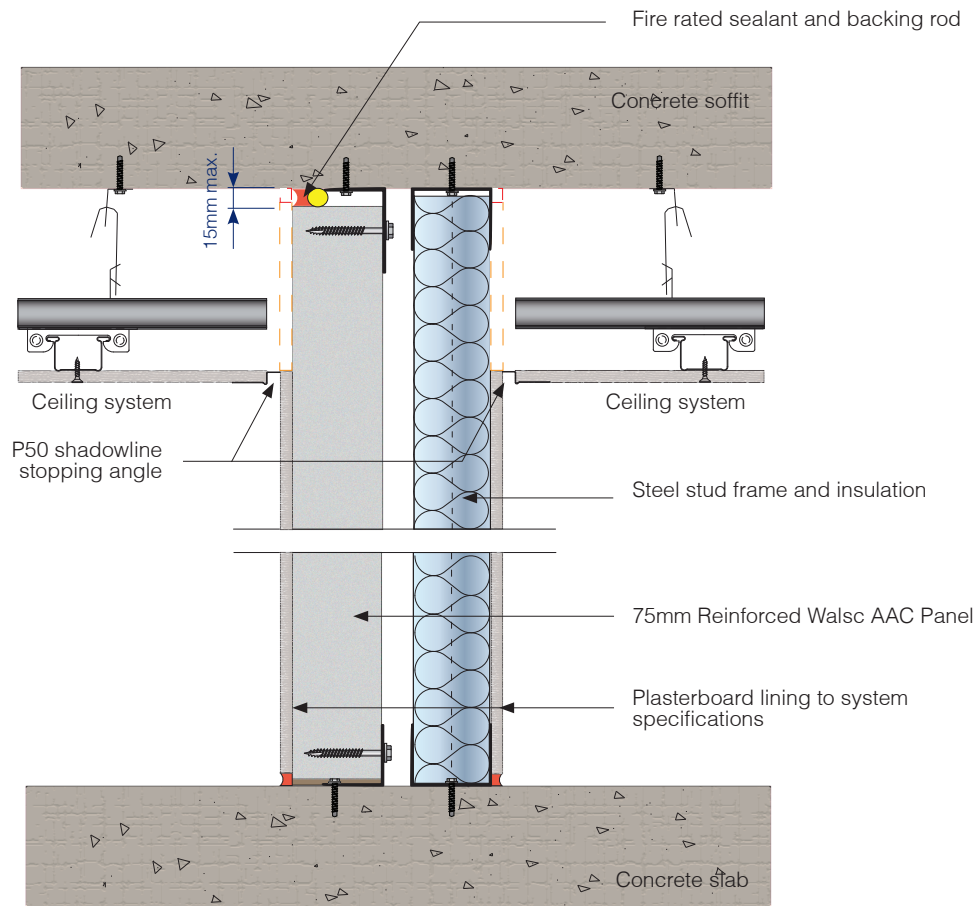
Option of Plasterboard Lining Stops at Ceiling Height Detail
